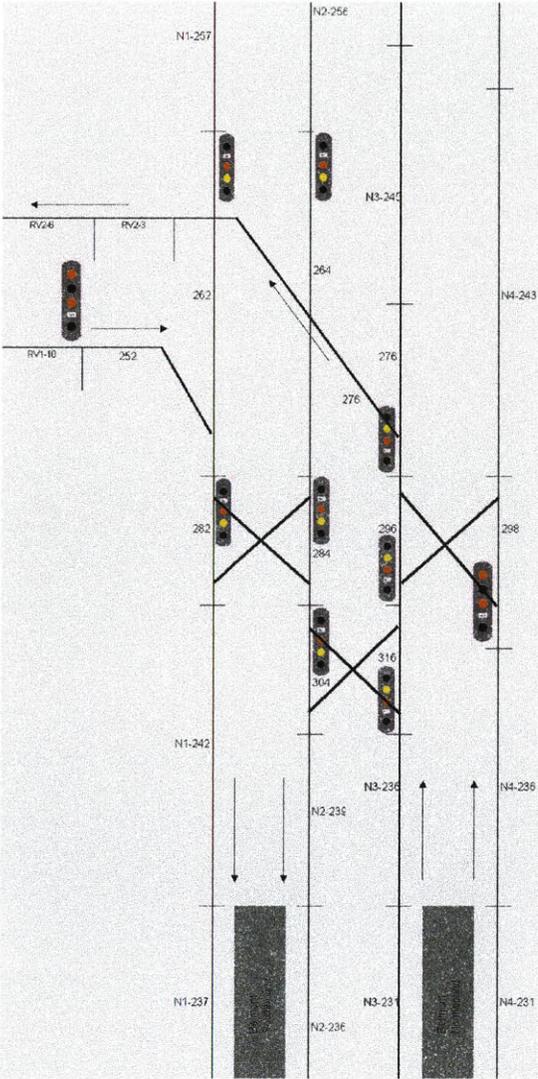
Proposed new Clark Junction configuration, 95% design (not to scale)
